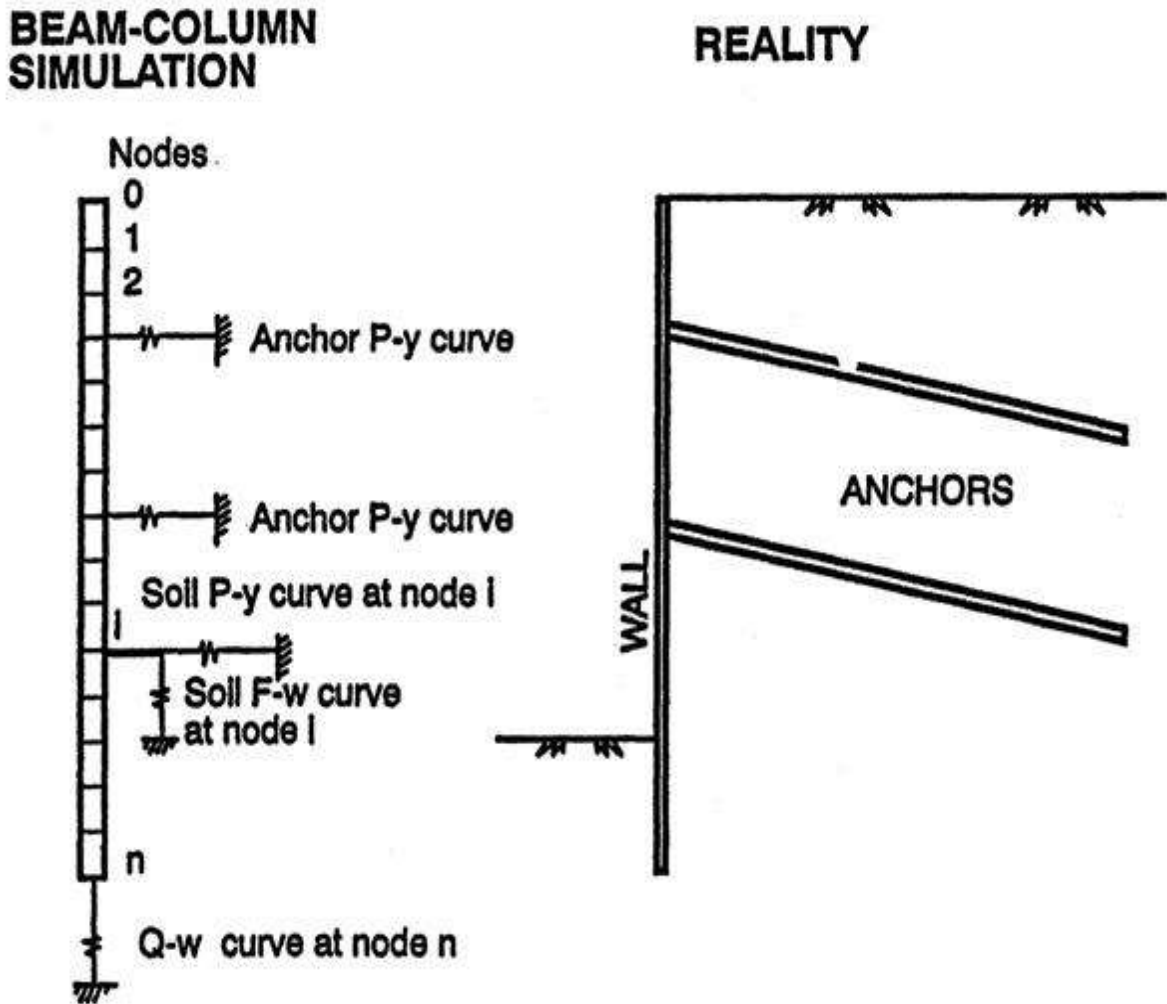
Boundary Element Model of Repeatable Section of Wall Briaud and Kim, 1998
